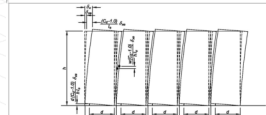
(b) Doubly Connected Section of Intermediate Precast Shear Walls
